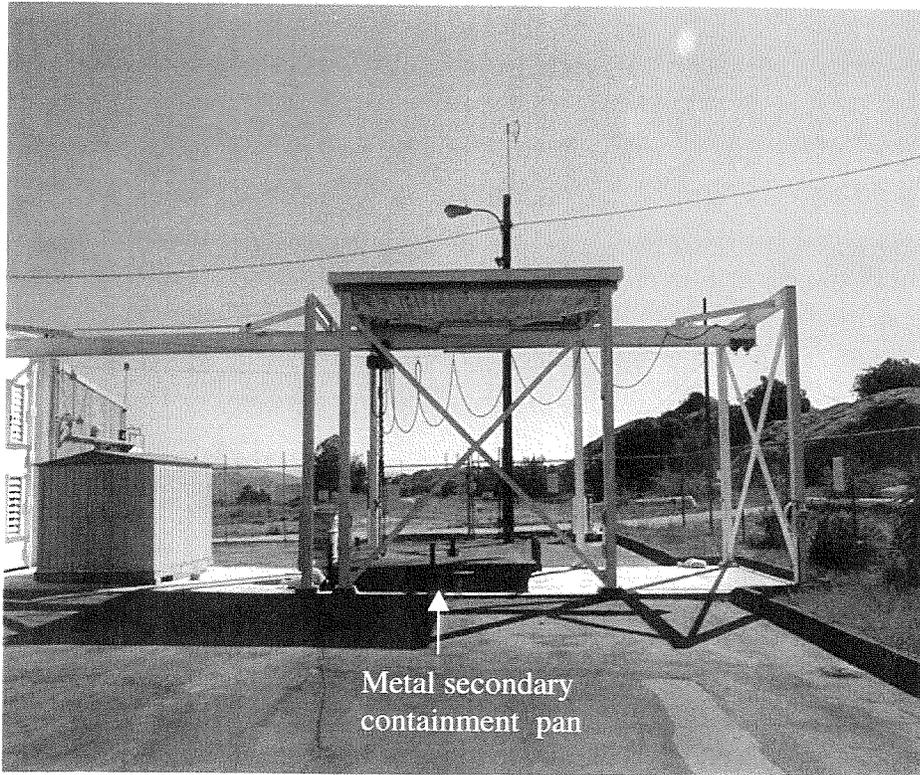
Size reduction area with concrete floor and over head lift (looking east). Size reduction performed under canopy (about 15 ft x 10 ft) within a metal secondary containment pan placed on the concrete.
